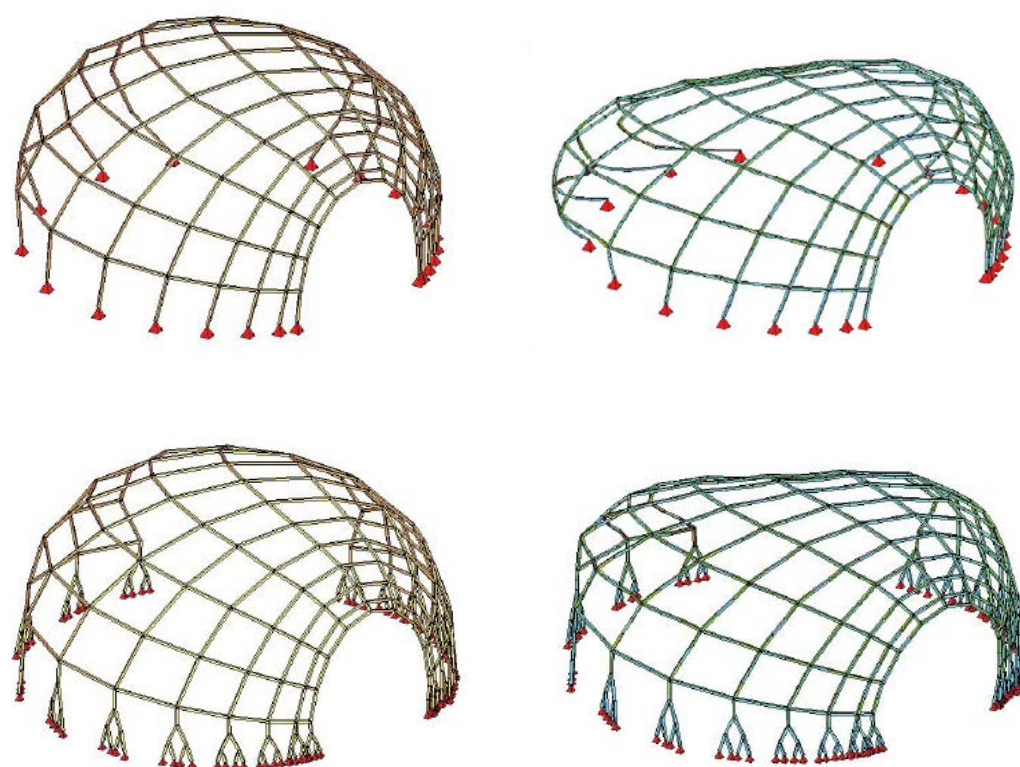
Evaluation of branching on anchor points principle. Structural analysis of point anchoring connection in comparison with branching anchoring connection. (Source: Emily Scoones, Elena Chiridnik)
